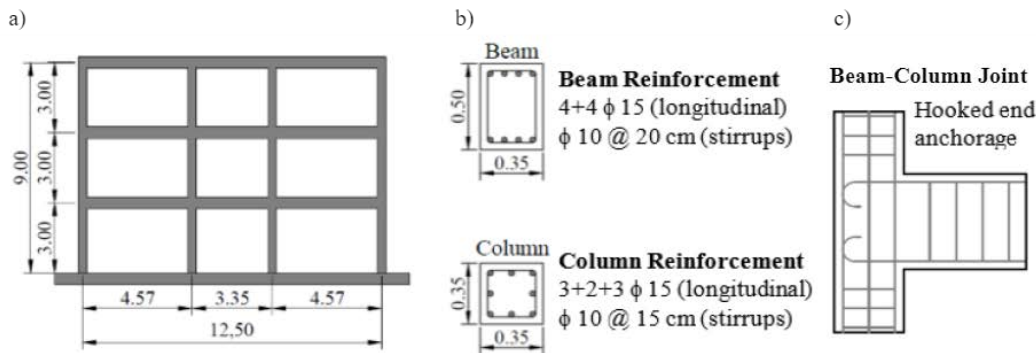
a) Geometric characteristics of the as-built structure, beam and columns cross-sectional area properties and reinforcement, c) beam-column joints reinforcement details.
